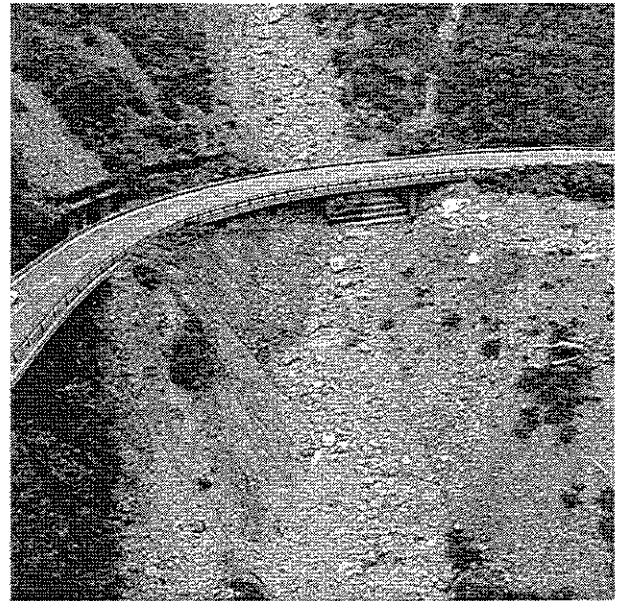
Computer Generated Image of Completed Candy's Creek Bridge
